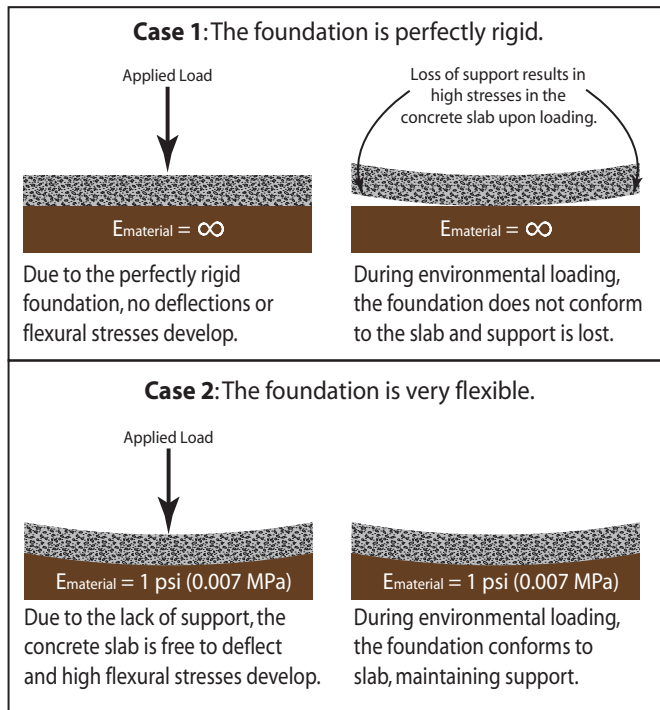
Illustration of the effects of foundation support on applied and environmental loads in a concrete pavement system. The best foundation support condition for a concrete pavement is somewhere between Case 1 and Case 2.
